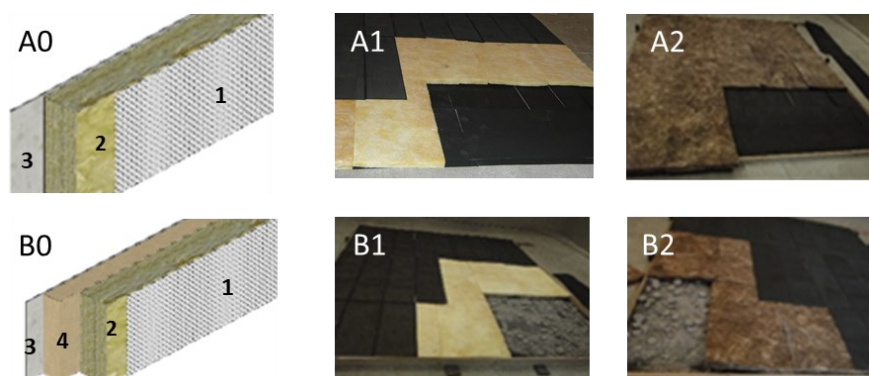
Diagram of acoustic barrier (1 - perforated rPE sheet (HD:LD 70:30) + NP; 2 - mineral wool type X / type Y; 3 - rPE sheet (HD:LD 50:50) + NP.; 4 - NP (briquettes)).
